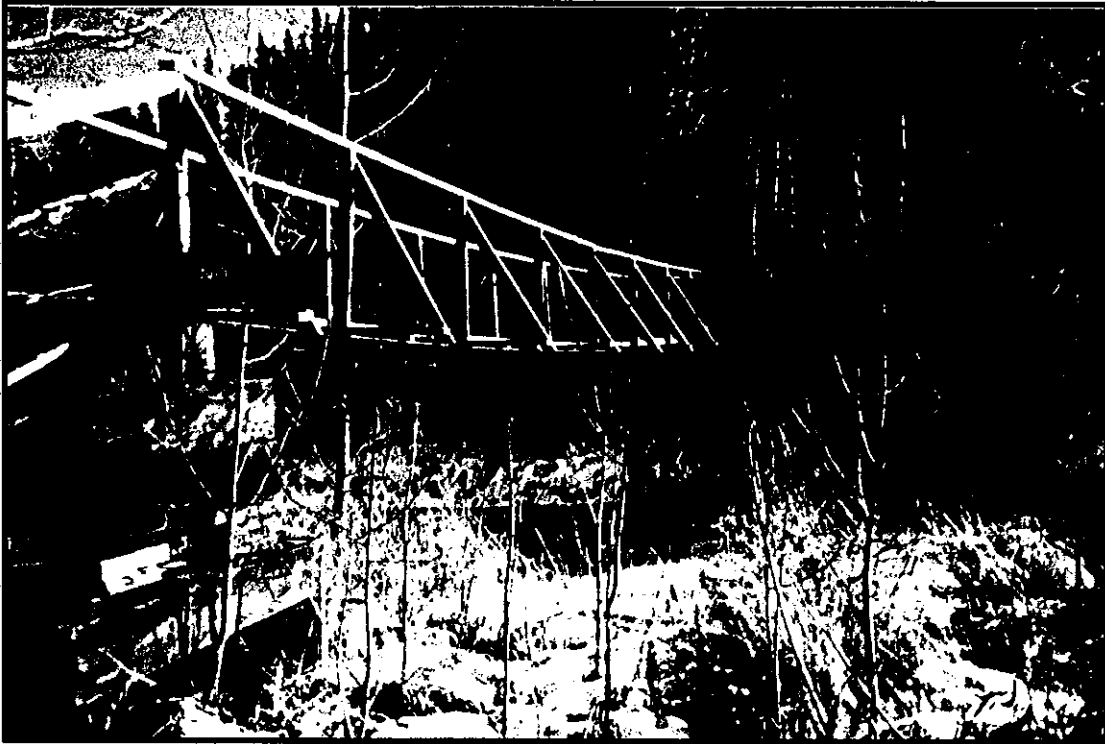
Footbridge on the Embarass River in the Mile 34 area.
